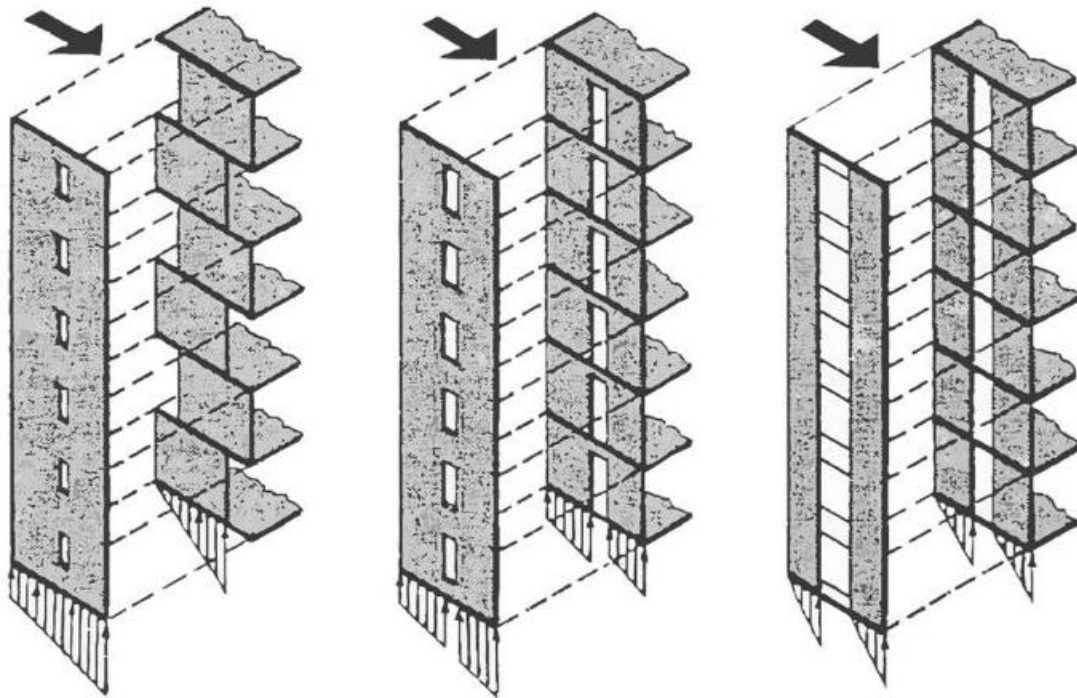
Stresses at coupled shear wall system and discrete shear wall system
